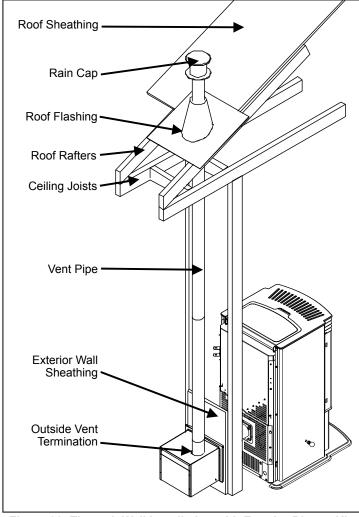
Through Wall Installation with Exterior Blower Kit; Vertical Termination.
